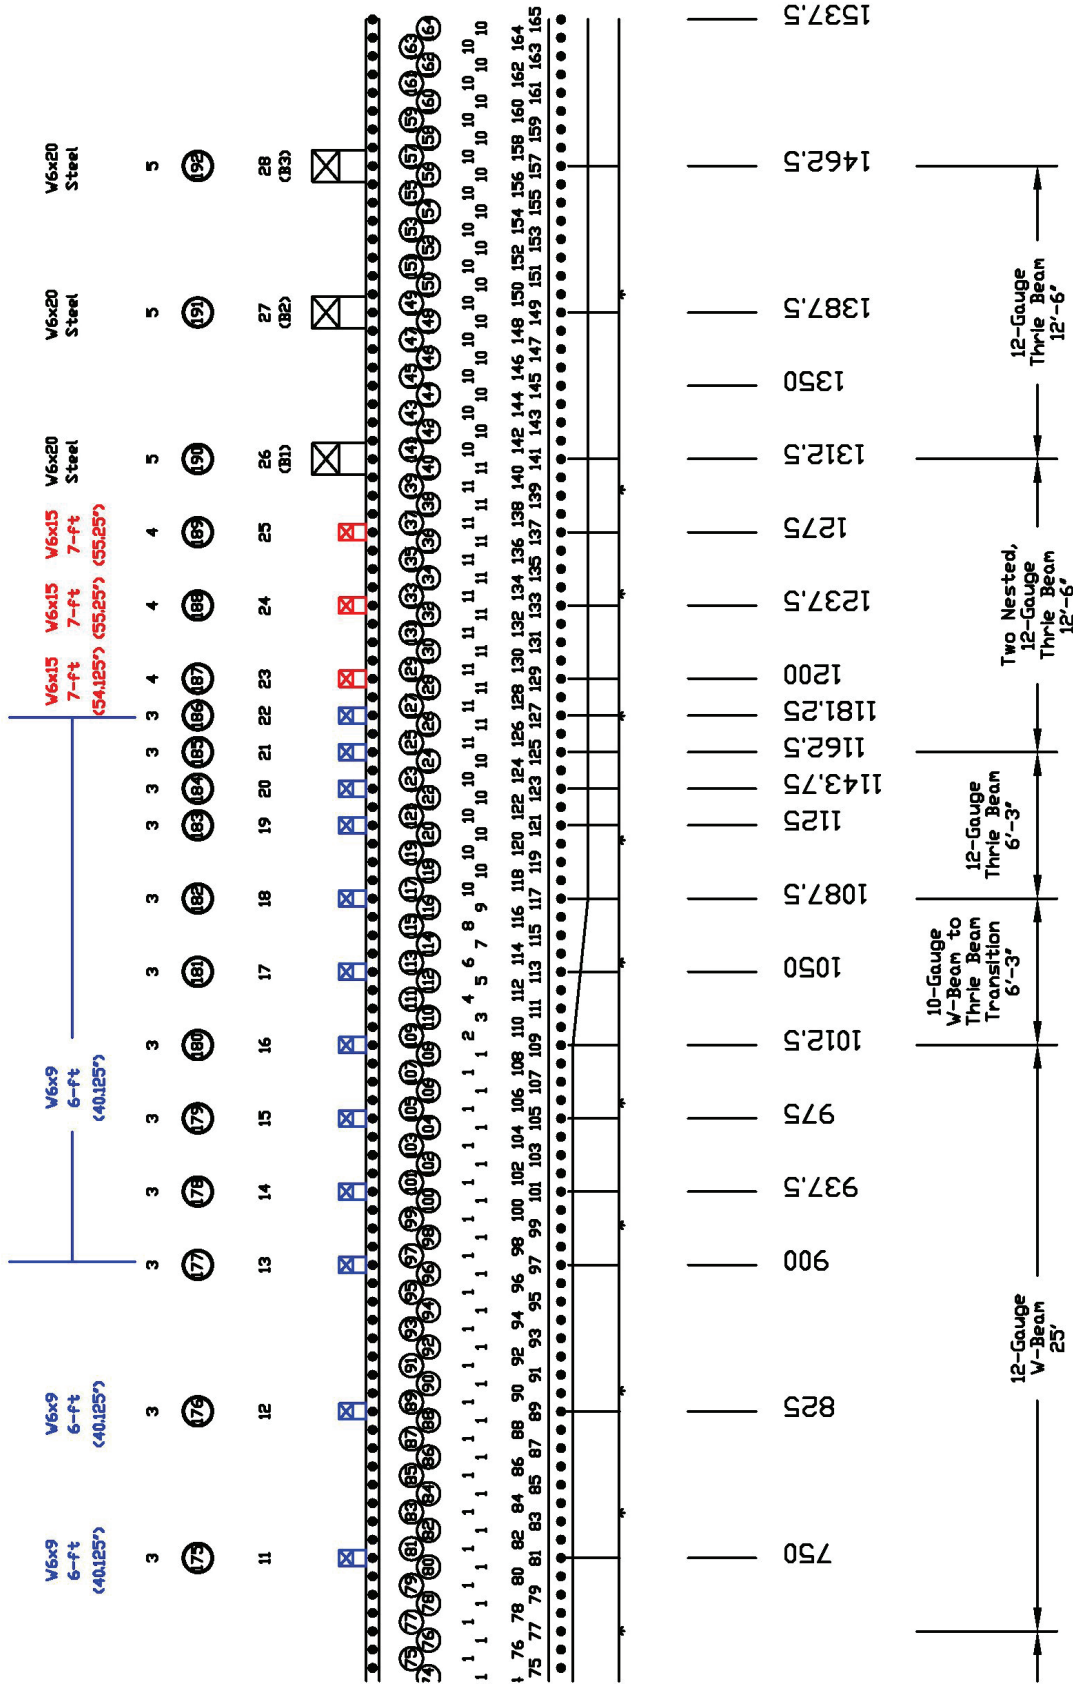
Layout Drawing of Design Configuration MGST-L (Continued)
